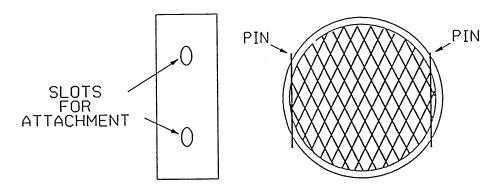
Rodent Guard for Pipe Outlet (Both double-walled plastic and corrugated metal pipe)
